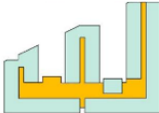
İsmail Necati Efendi dormitory normal floor plan
